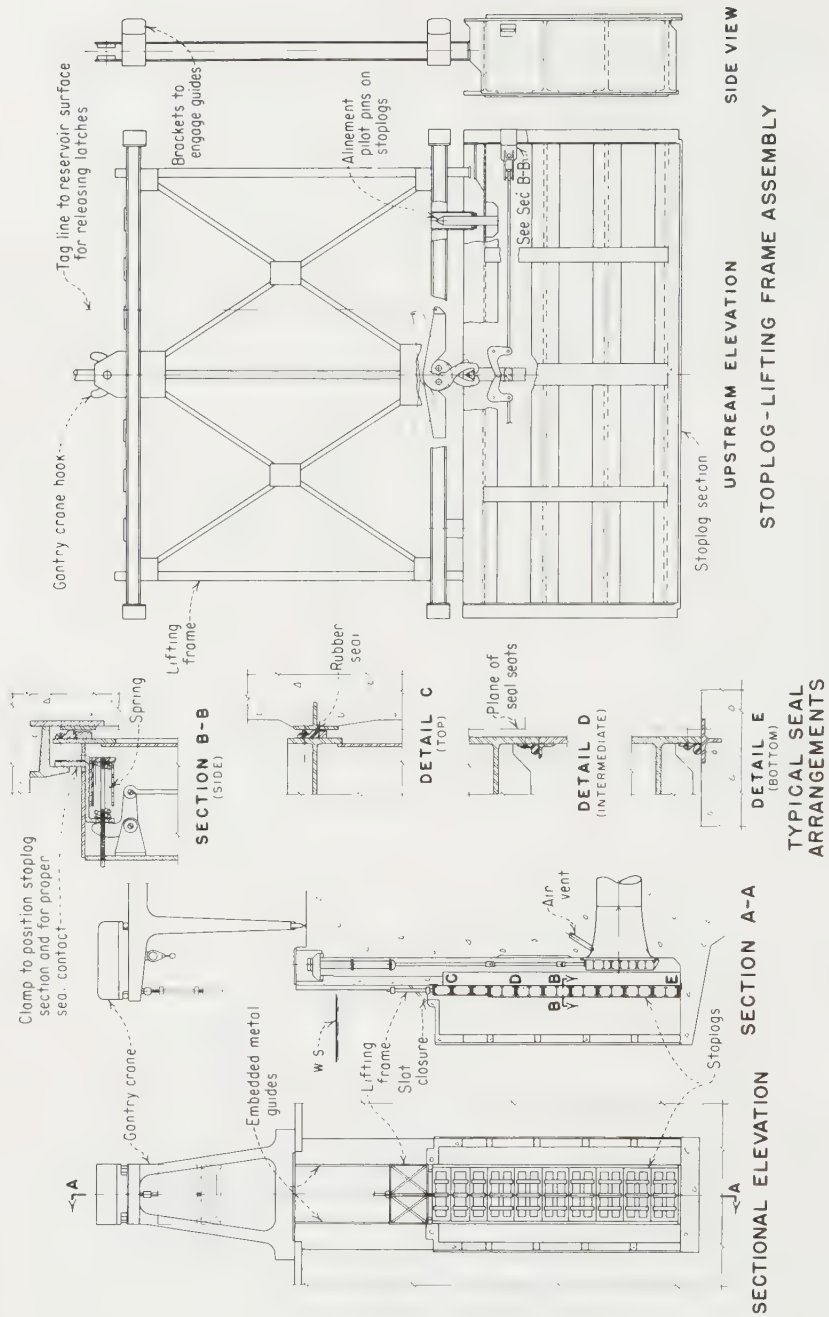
Typical stop-log installation and lifting-frame arrangement.
